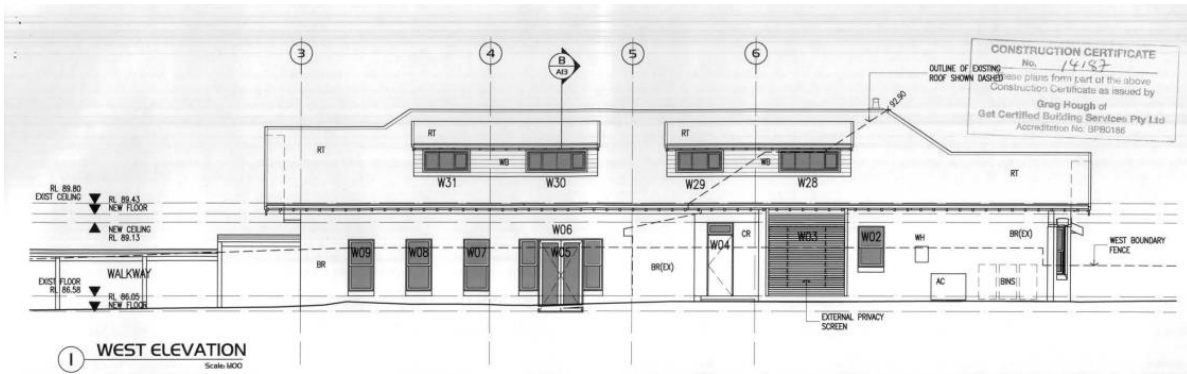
West Elevation of Proposed alterations and additions to dwelling dated from 2014
